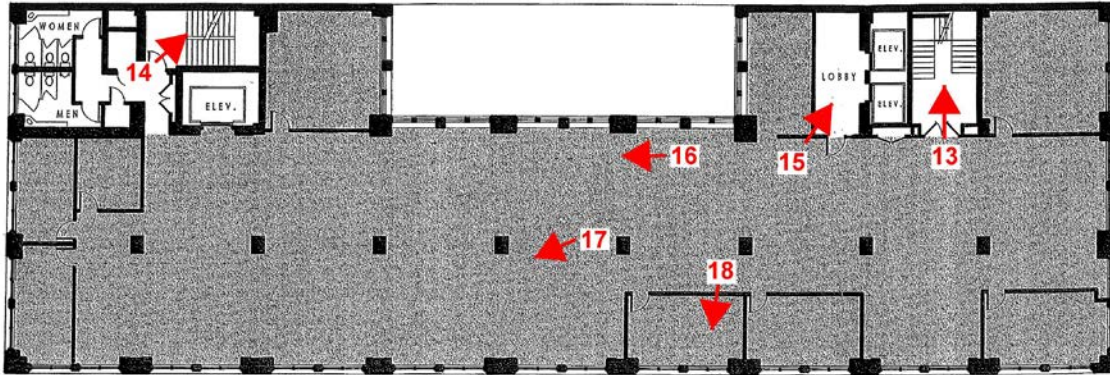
Typical upper floor plan and photo key, *Continental Real Estate*.
